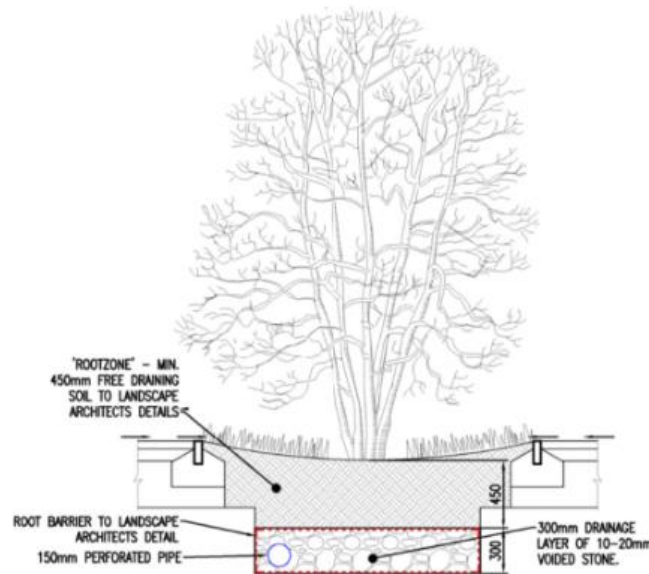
Typical Raingarden/Bioretention Tree Pit Arrangement
